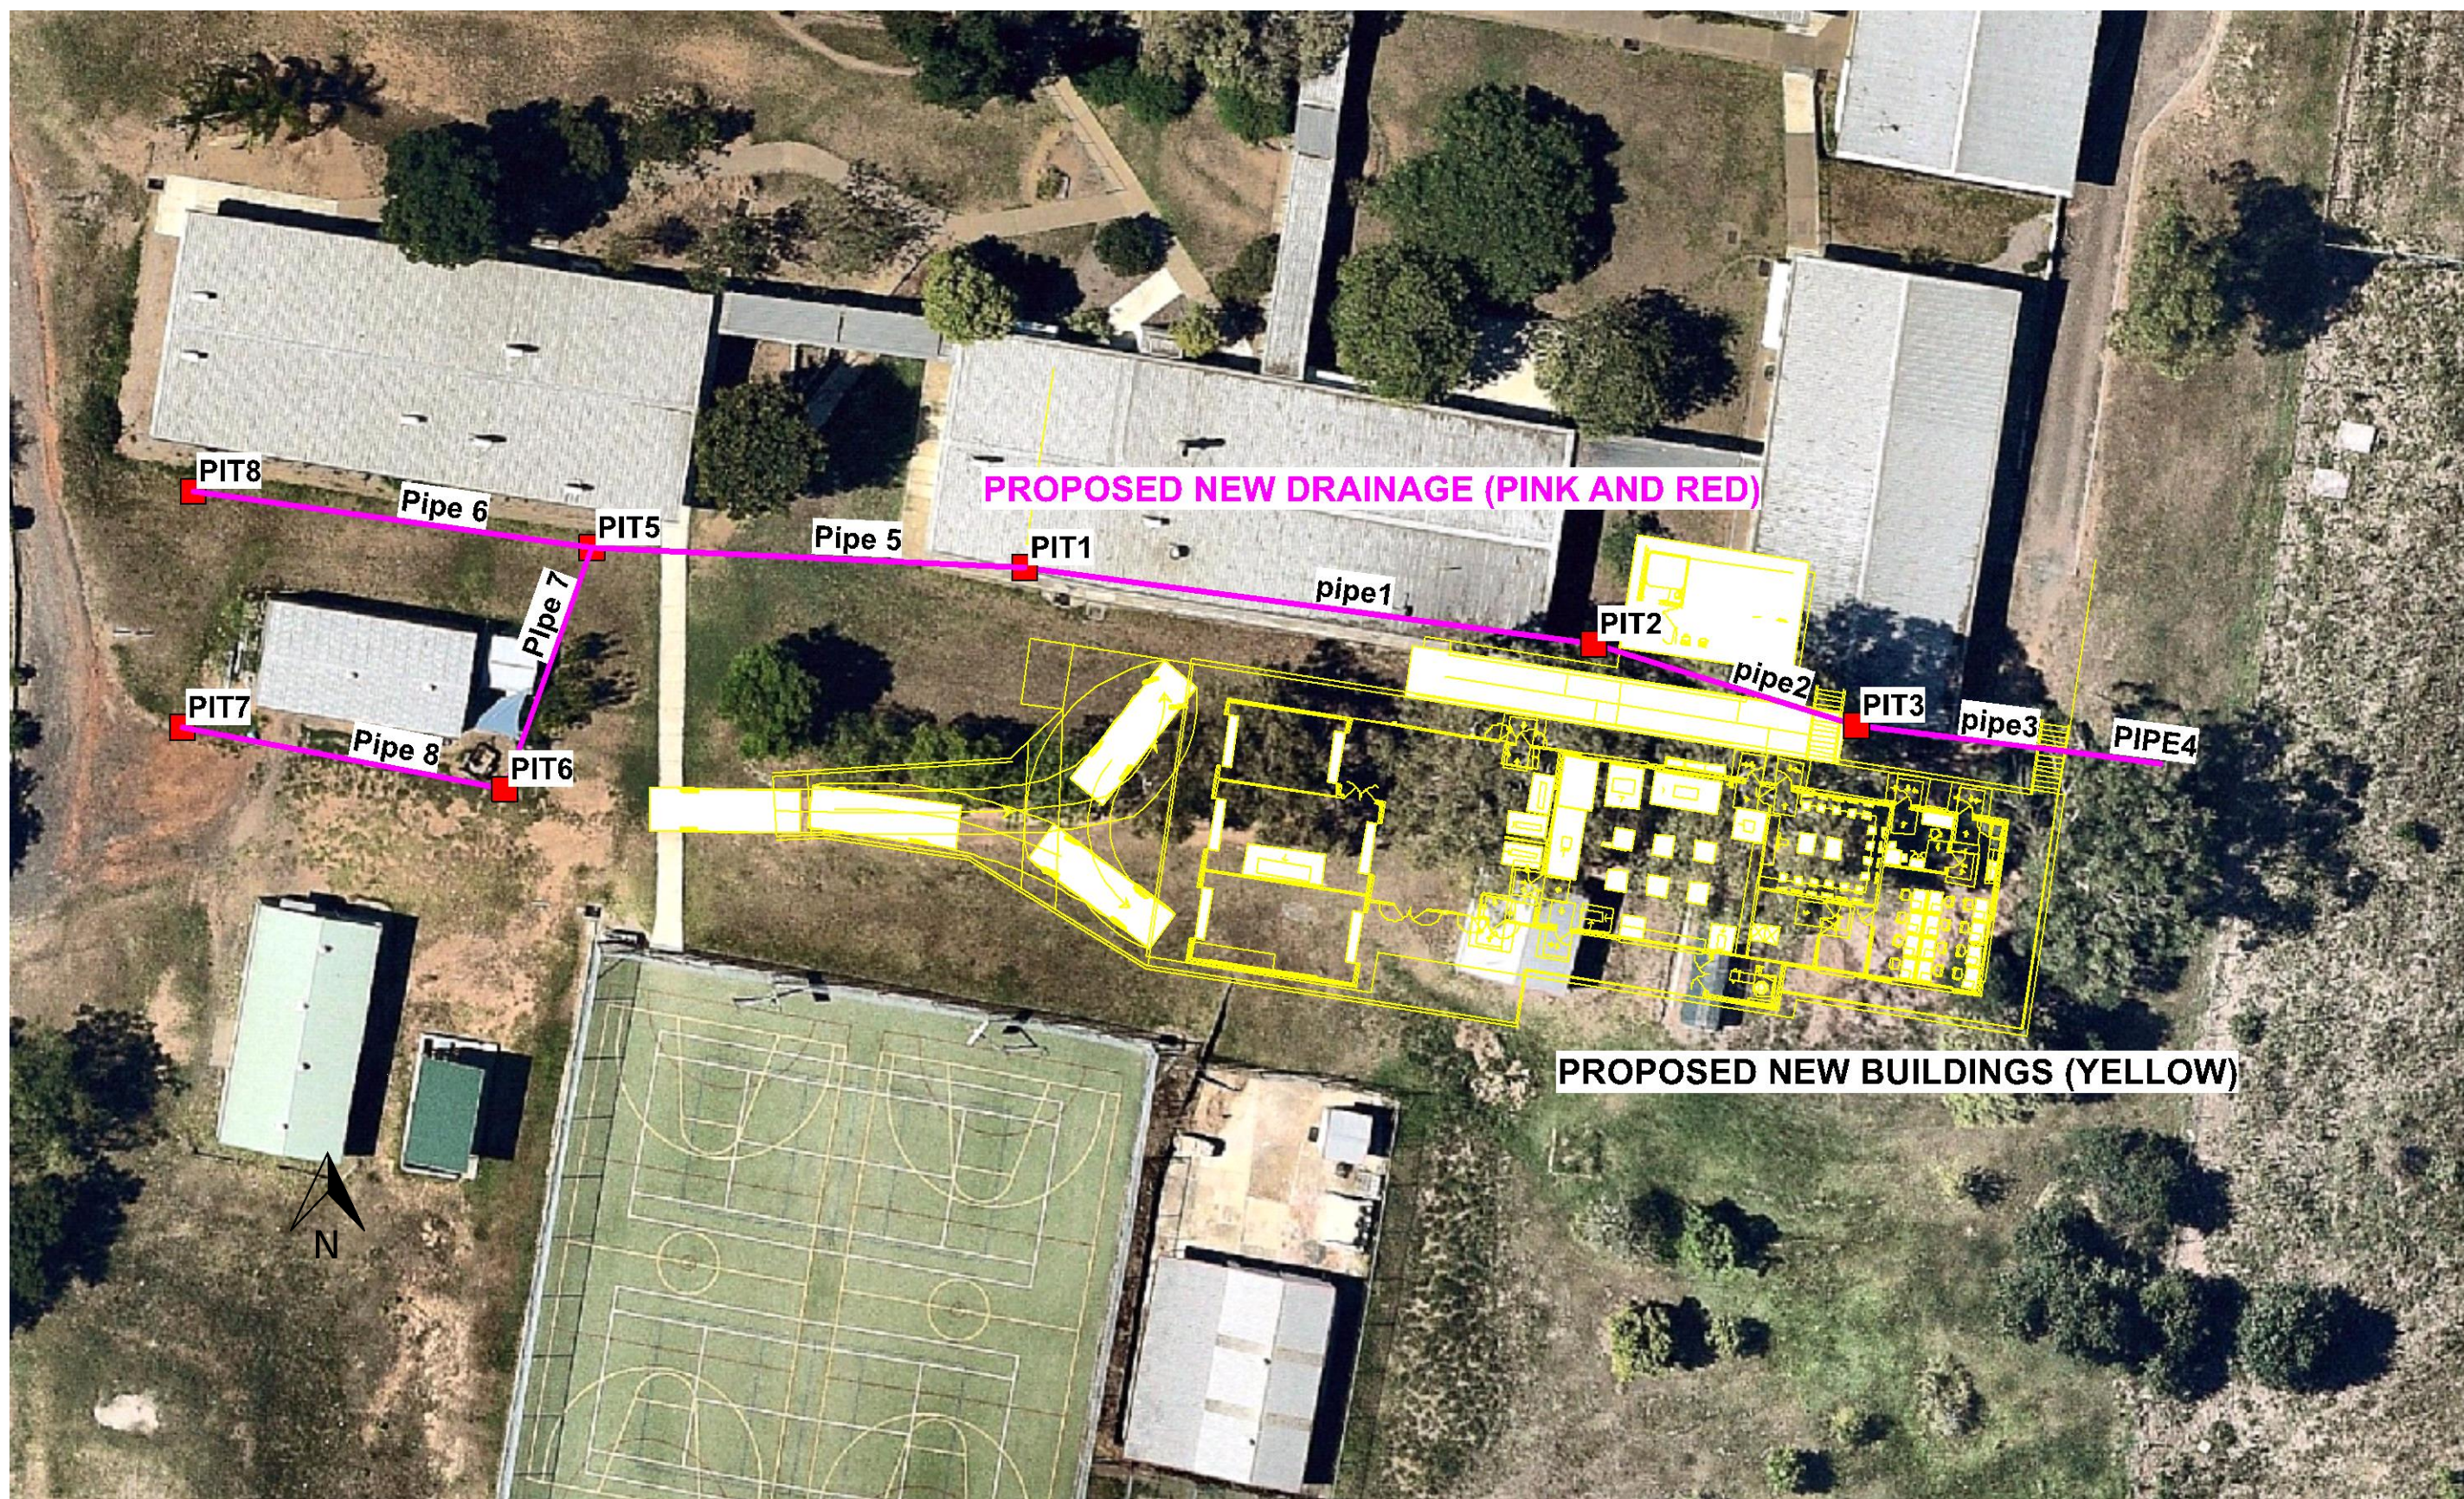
Proposed Building and Drainage Upgrades, Scale 1:400 @ A3
